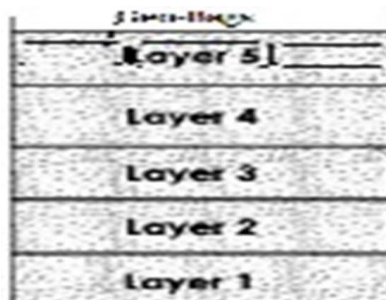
Schematic representation of test specimen with reinforcement by geo bags at top 1/5th layer
